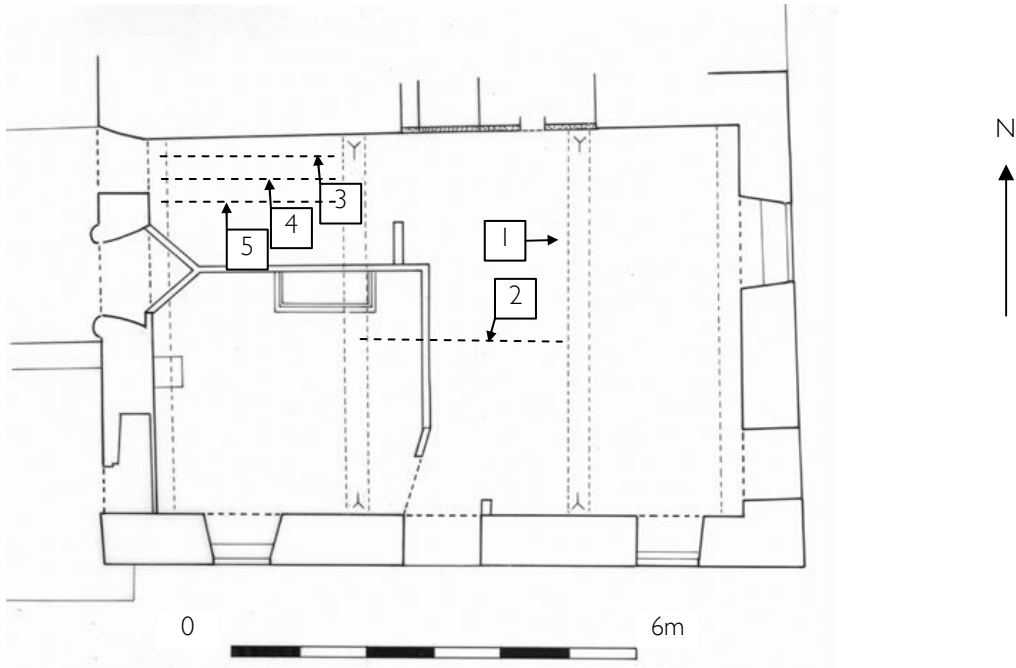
College House, Masham, ground floor plan (drawing with permission Jen Deadman)
